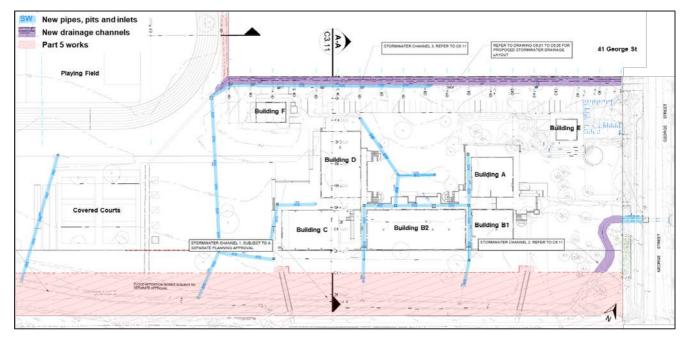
| New flood and drainage infrastructure provided on site (Base source: Applicant's SRtS 2022)
